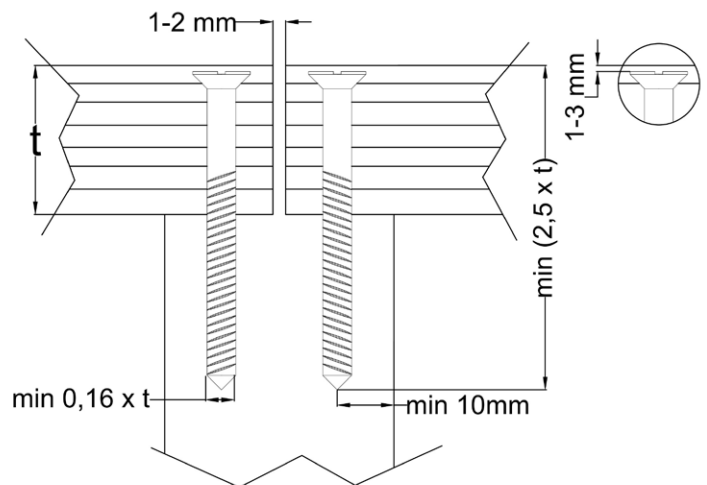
Installation of TG0 Paged plywood on floor joists.
